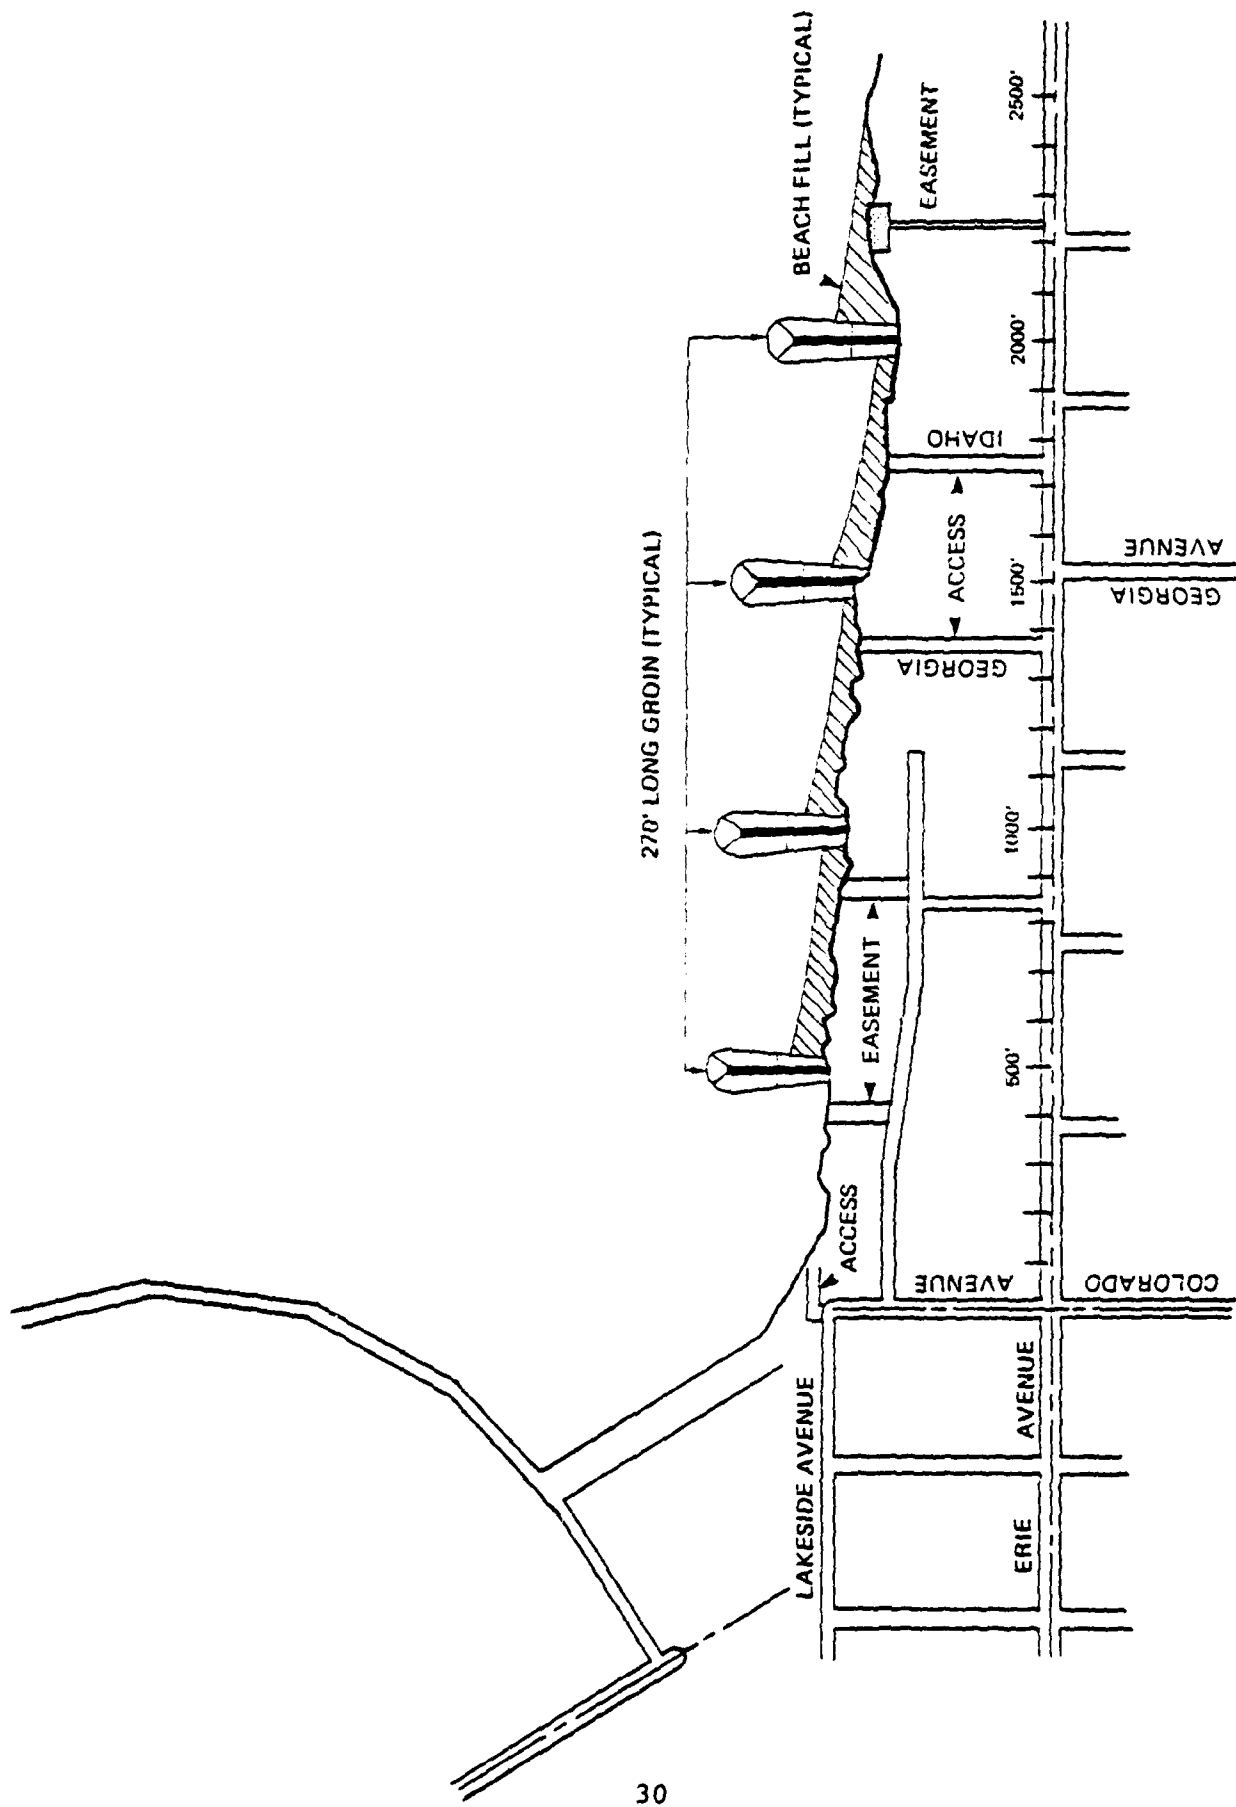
ALTERNATIVE IV GROIN SYSTEM WITH FILL PLAN
